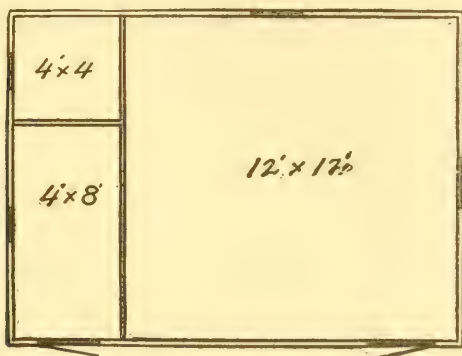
GENERAL PLAN OF FLOOR. (ORIGINAL)
